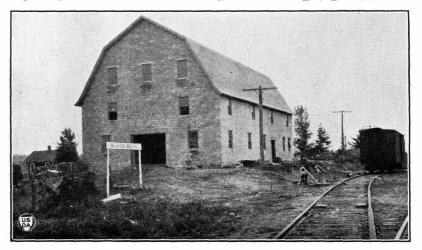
Cement-block cranberry storage house, Beaver Brook, Wis.
